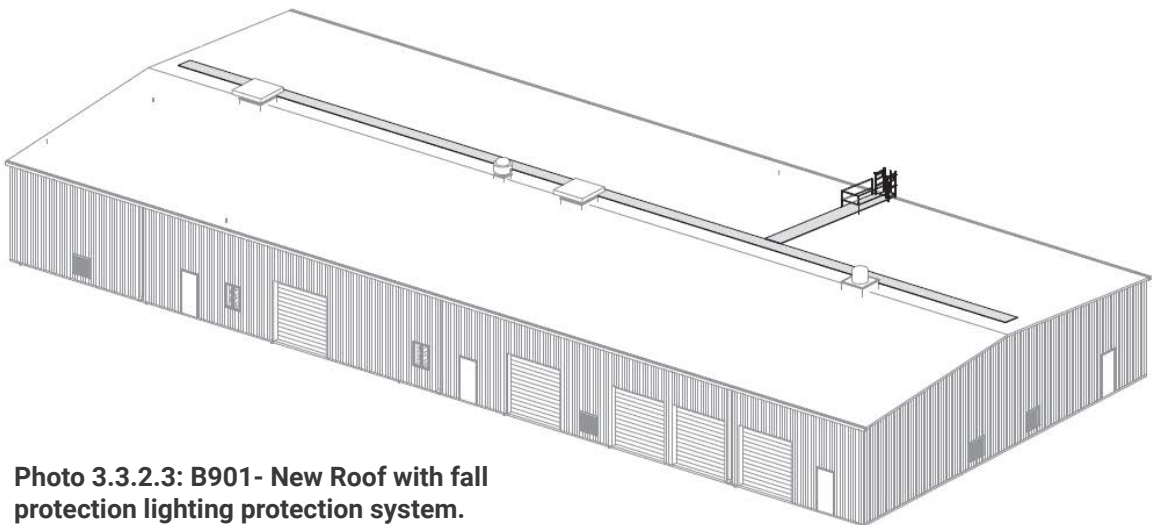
B901- New Roof with fall protection lighting protection system.
